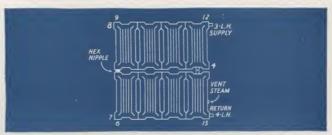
Assembled in eight sections in two tiers. For two pipe steam using adjustable spacing saddle.
